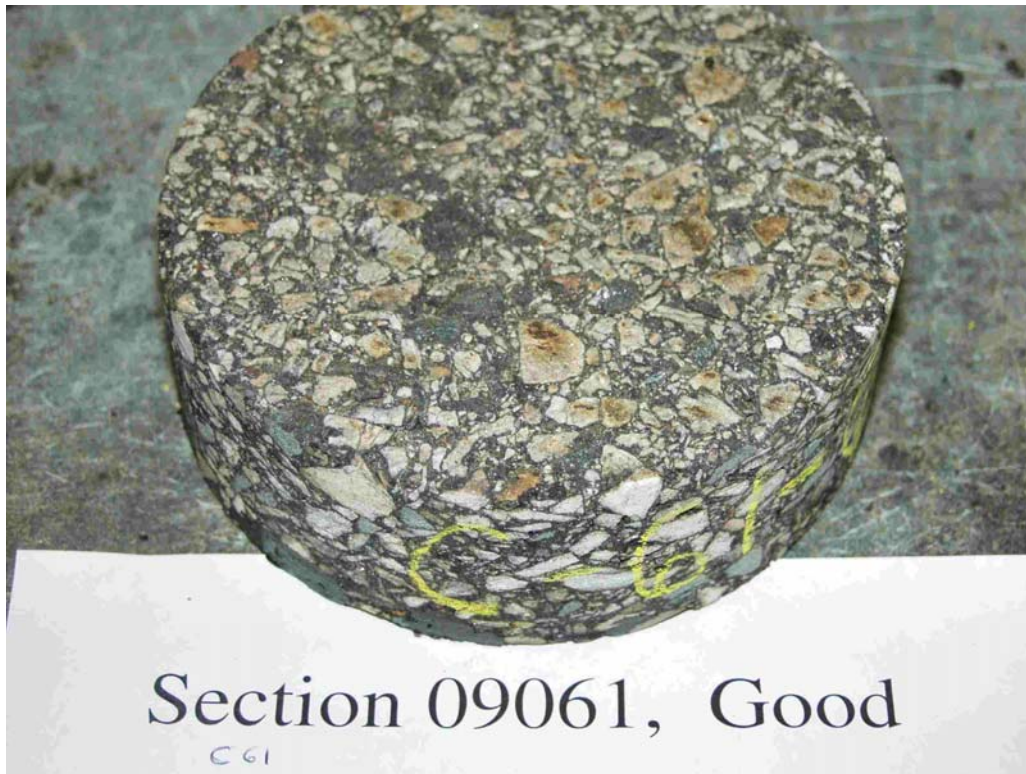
SIX-INCH PAVEMENT CORE FROM TYPICAL PORTION OF SECTION WB 5.
